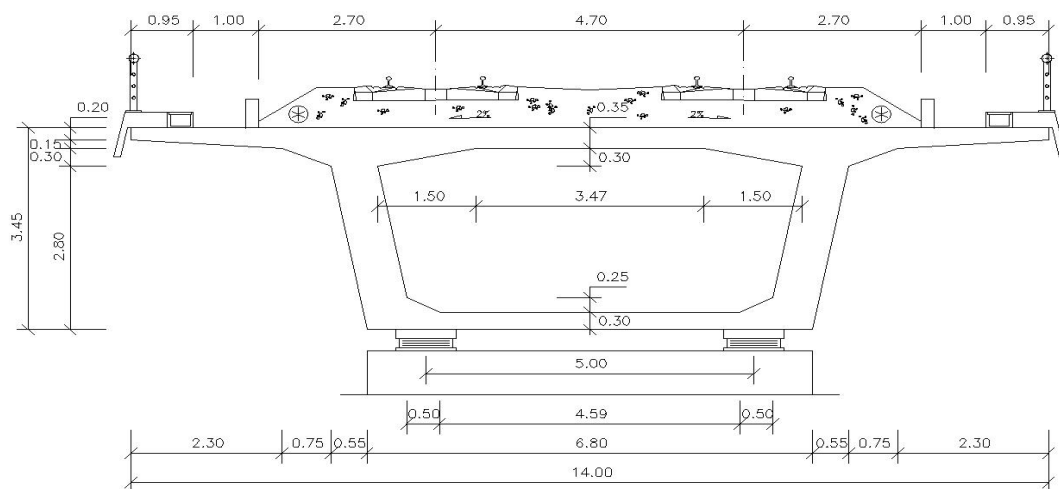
Deck-section considered for the 60 m span railway viaducts
